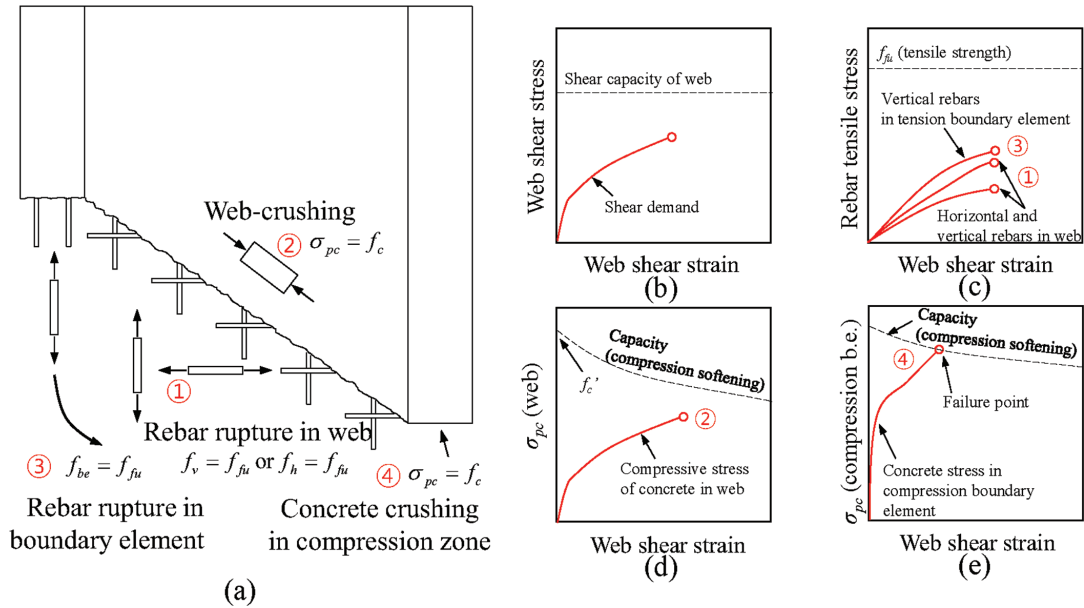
Potential failure modes: (a) components; (b) stress-stain in web; (c) reinforcing bar stresses in web and tension boundary element; (d) concrete stress in web; and (e) concrete stress in compression boundary element.
